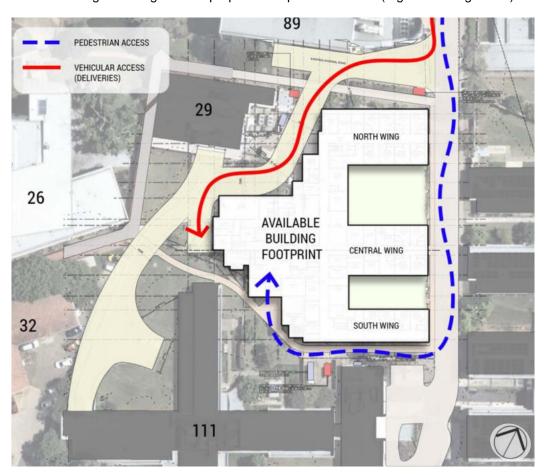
Proposed building footprint and access, not to scale (Source: NBRS, 2023)
